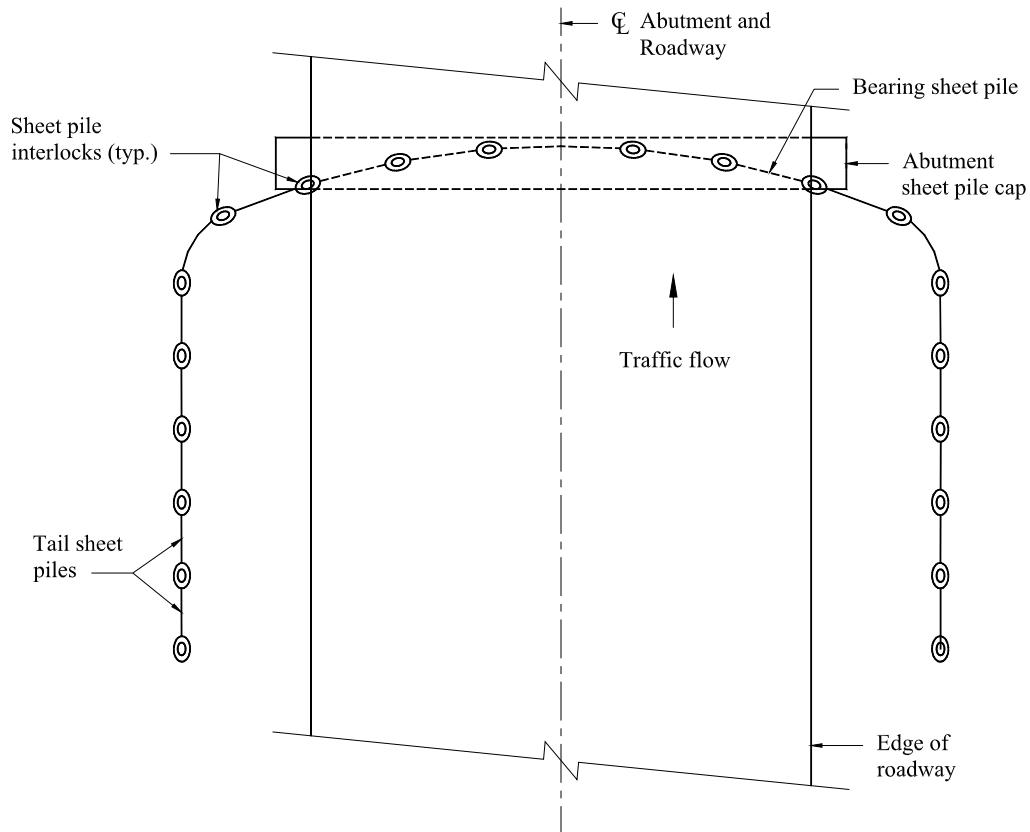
Plan view of an open cell sheet pile abutment [adapted from Nottingham et al., 2000].
